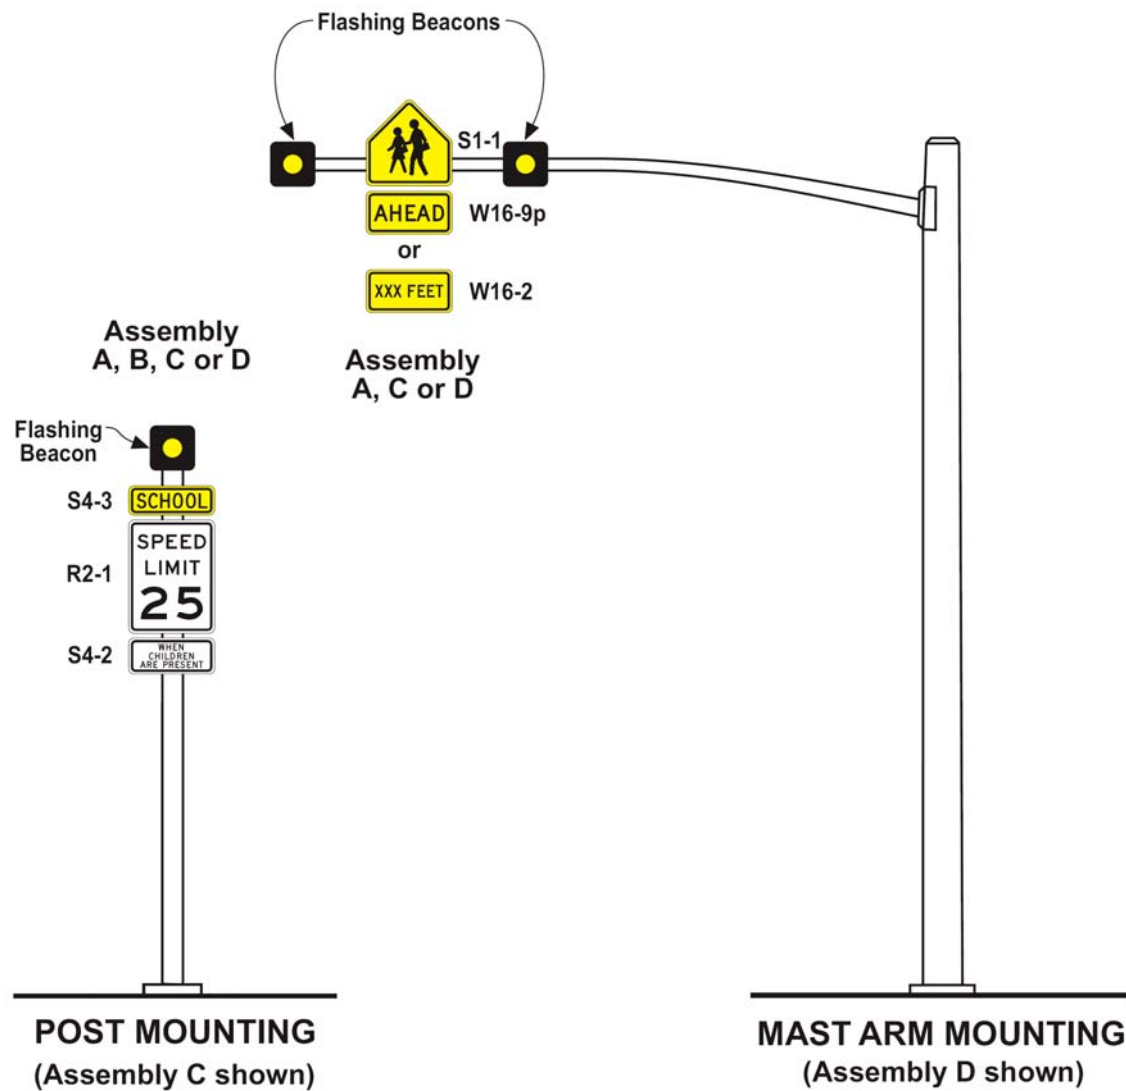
B-104. Example of School Area Signs with Flashing Yellow Beacons
